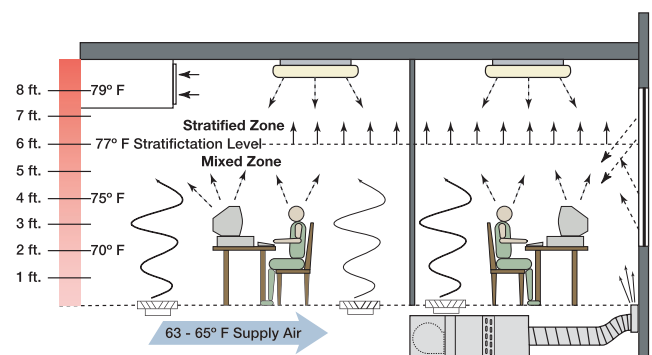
is a diagram of one of many building designs utilizing the raised floor concept.
